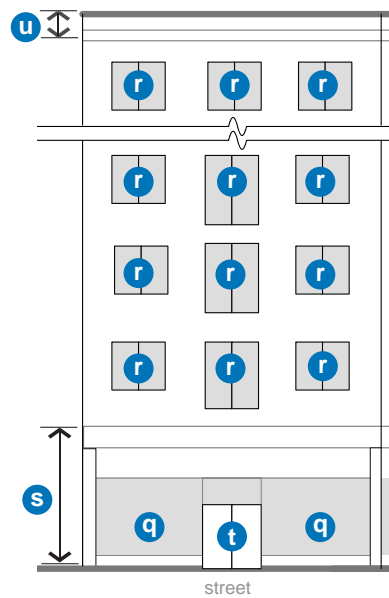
(3) Storefront Building: Street Facade Requirements
